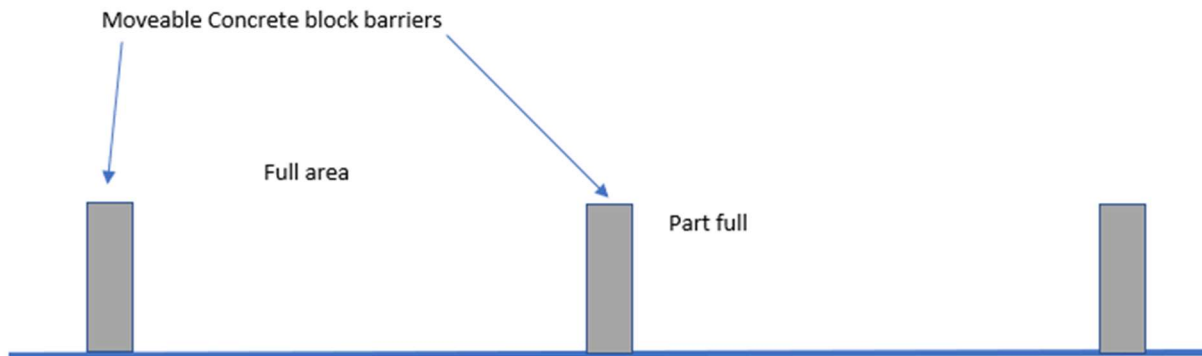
Clean Fill storage prior to testing and rejection or transfer to gravel pit site.
